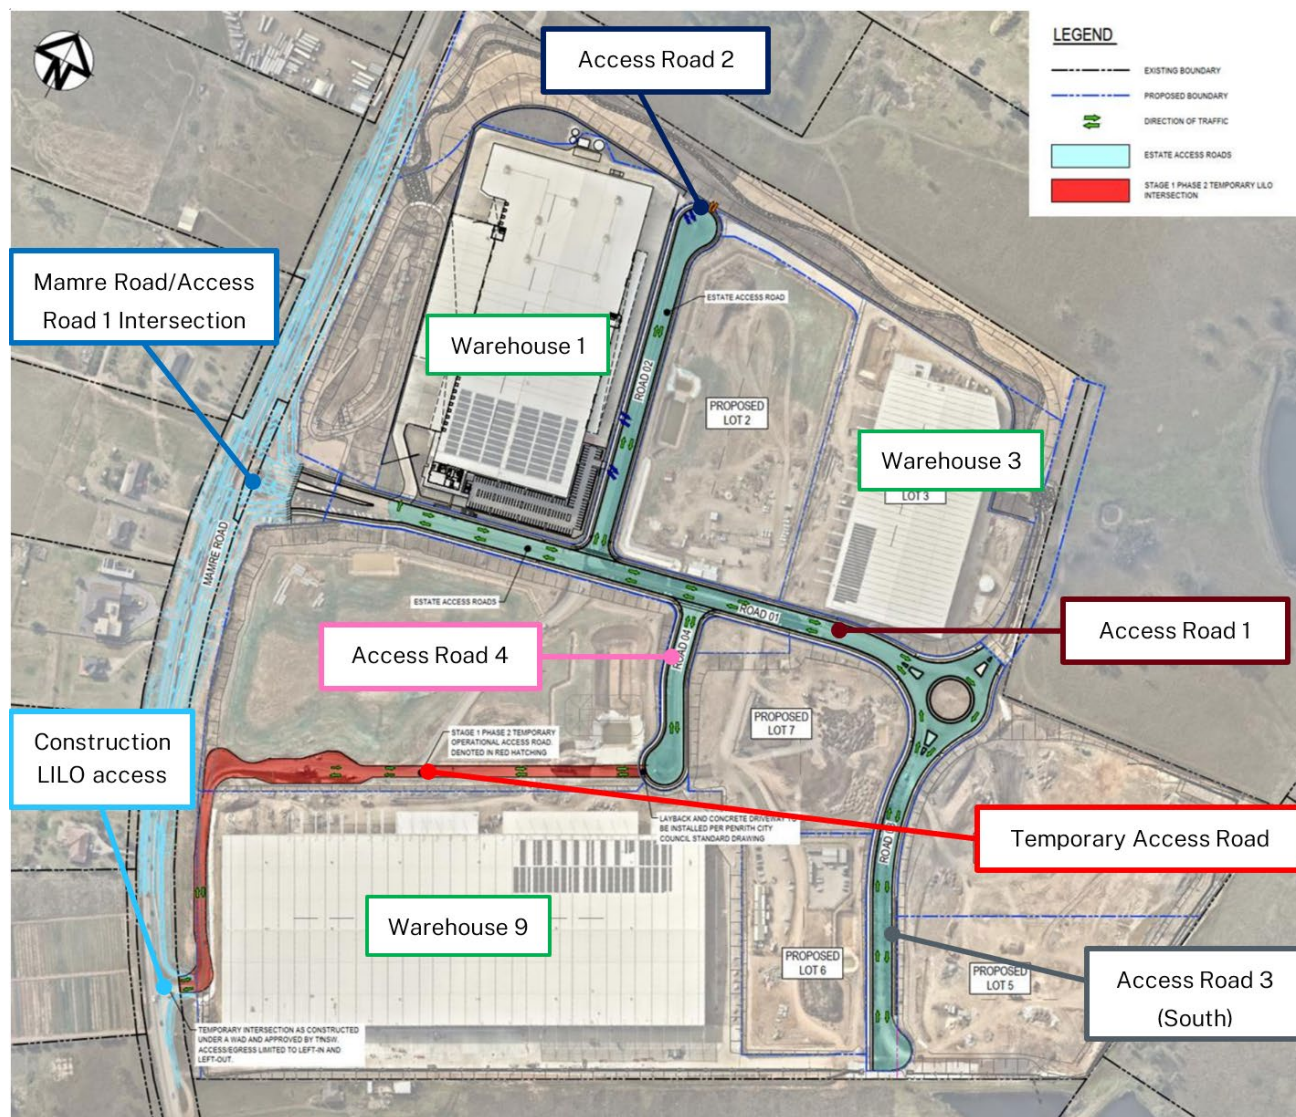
Construction Left-in/Left-out Access, Temporary Access Road, and AIE Access Roads
